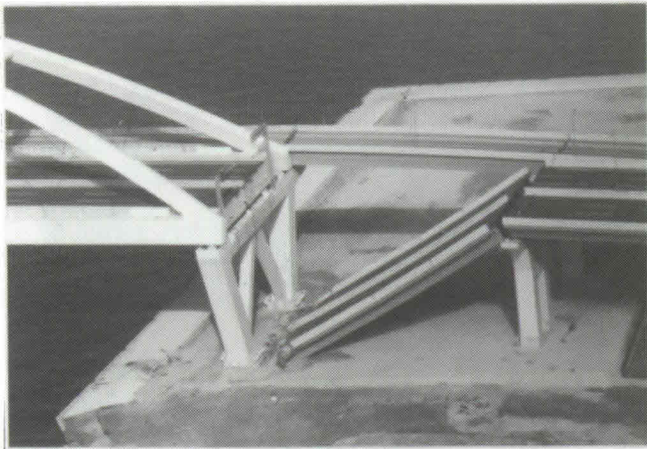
Collapsed approach road girder due to the seaward movement of Nishinomiya Harbor Bridge foundations (Bayshore Route)
